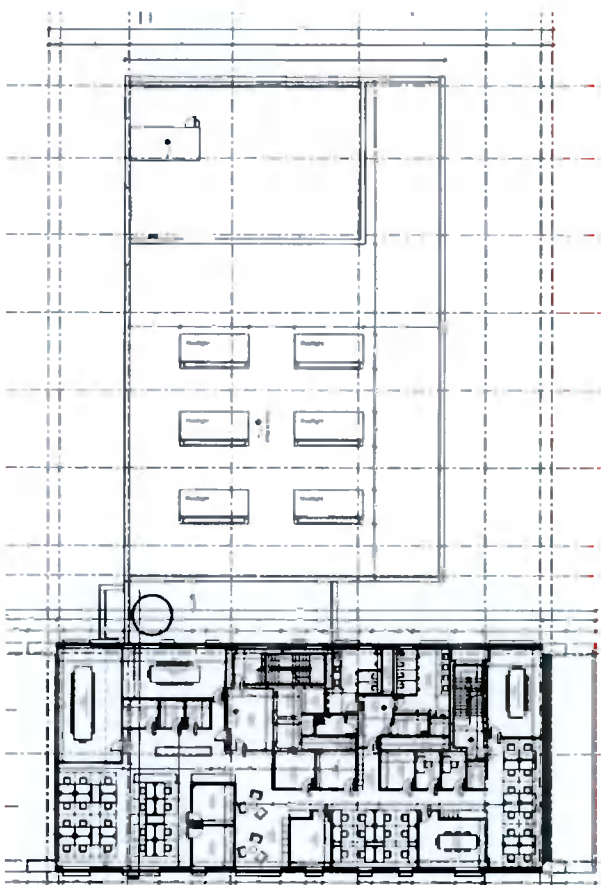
C.A.B. Proposed 2nd Floor Plan (Level 03) (image updated)
